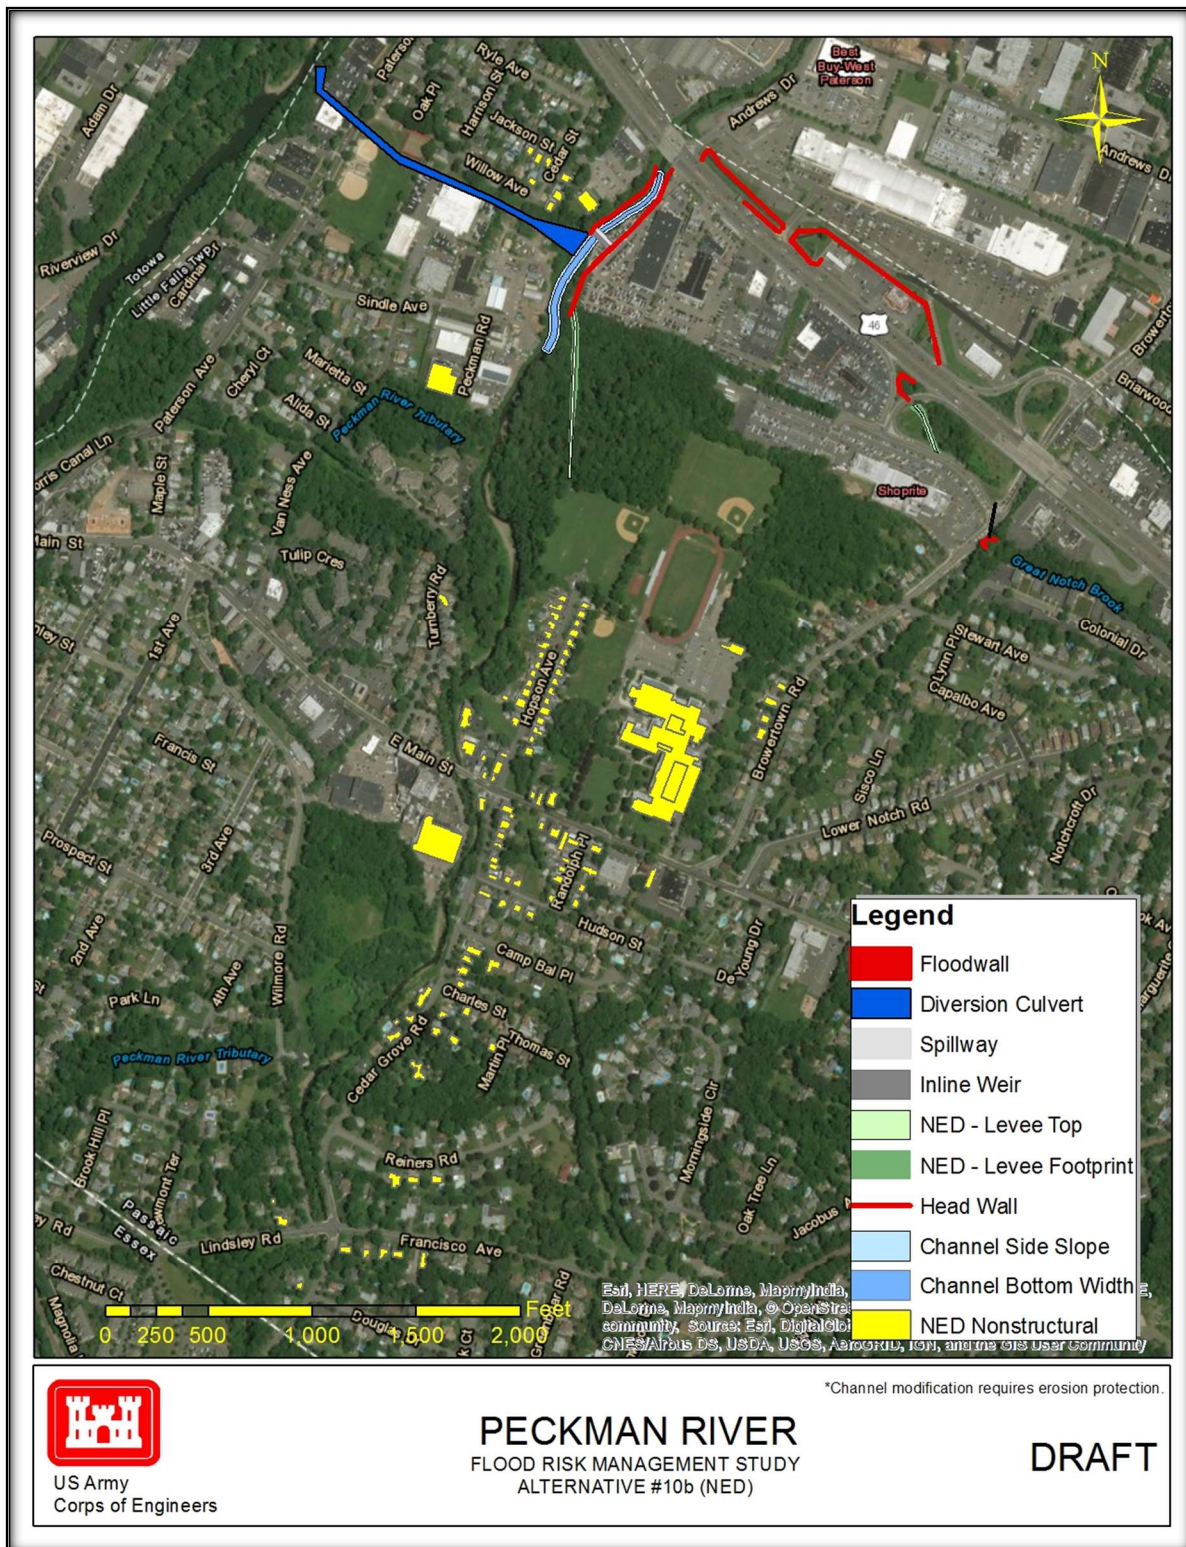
Alternative #10b –Nonstructural Combined with Diversion Culvert.
